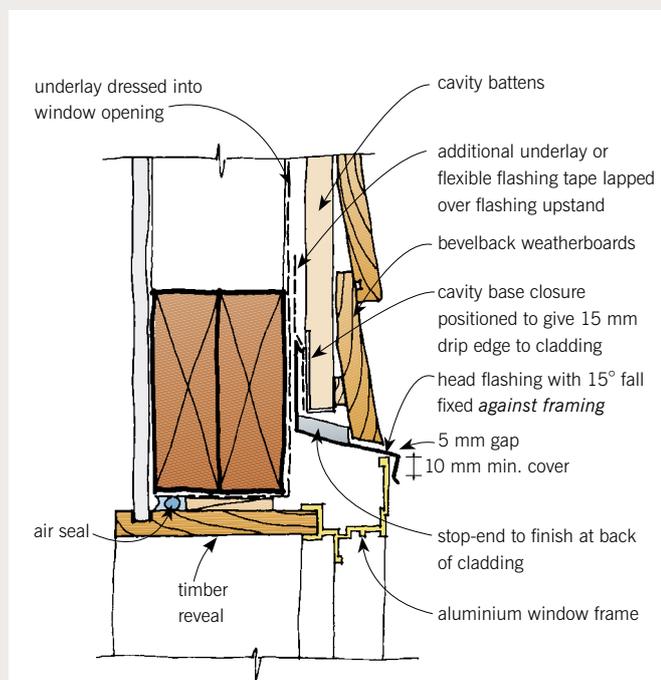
E2/AS1 detail of window head flashing with cavity-fixed, bevelback weatherboards.
